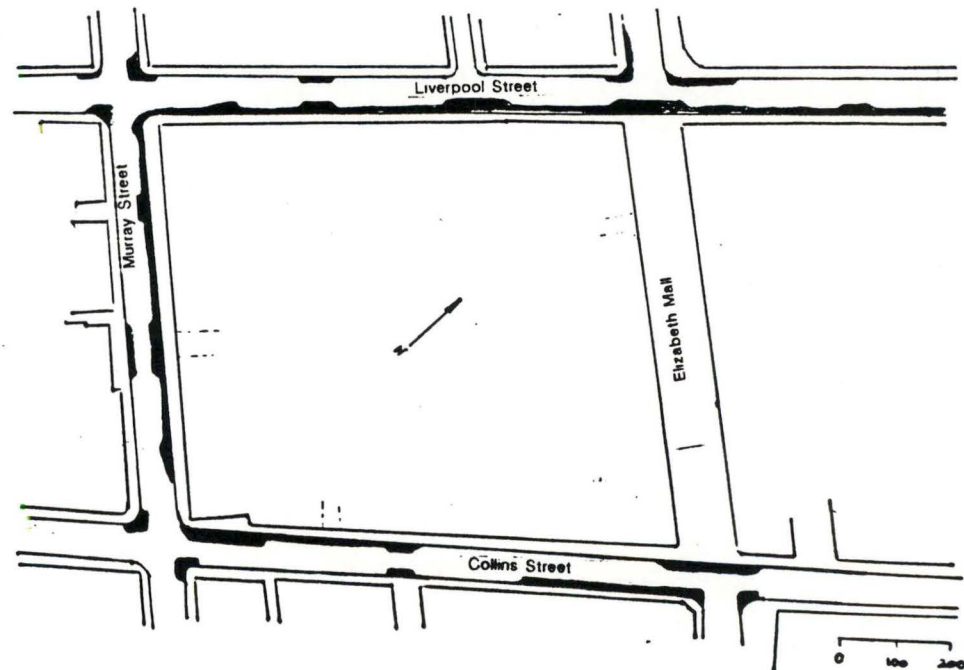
Proposed road pavement width reduction surrounding Hobart's central street block
